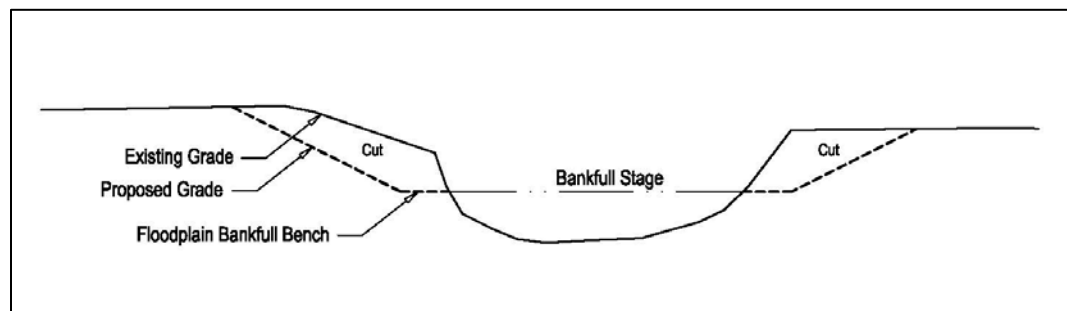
Schematic of lowering the Bank Height Ratio through the excavation of narrow floodplain benches into high river banks (8/16/13)
